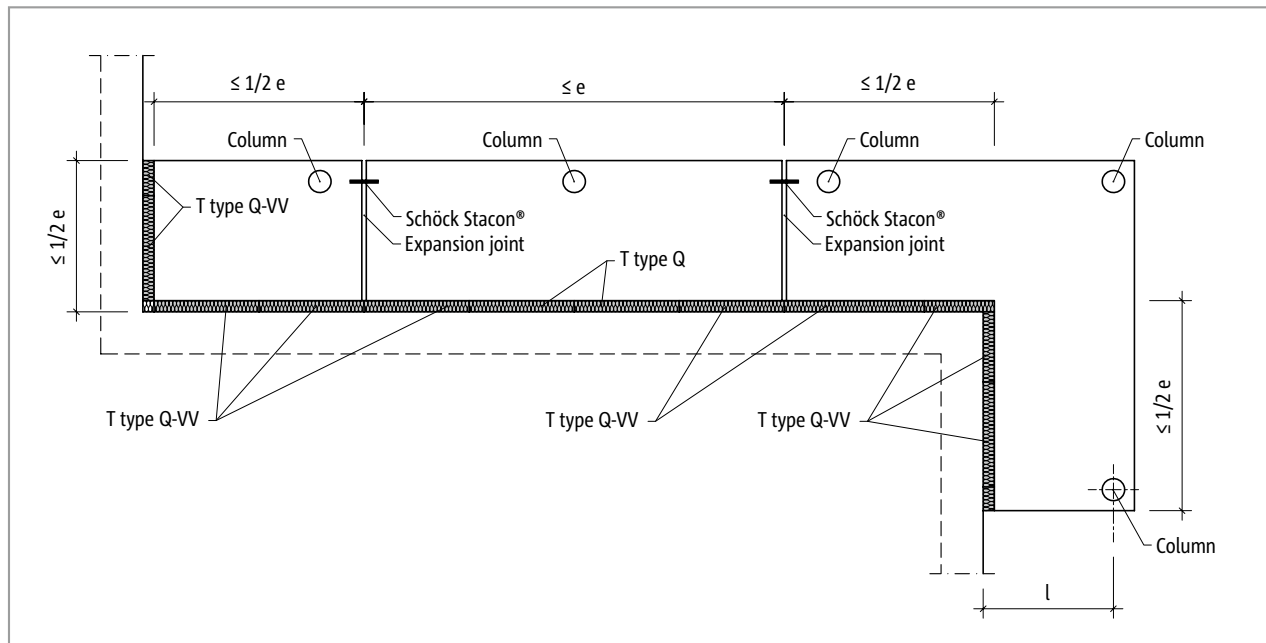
Schöck Isokorb® T type Q, Q-VV: Expansion joint layout
